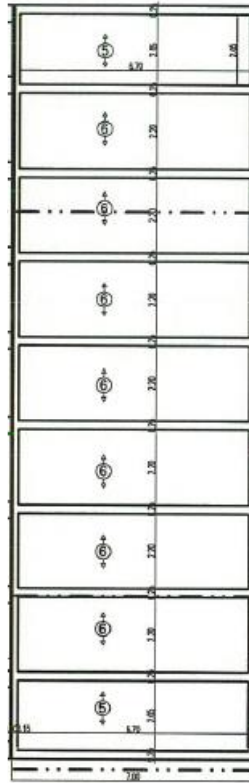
Plane of simple beam slab with characteristic dimensions
